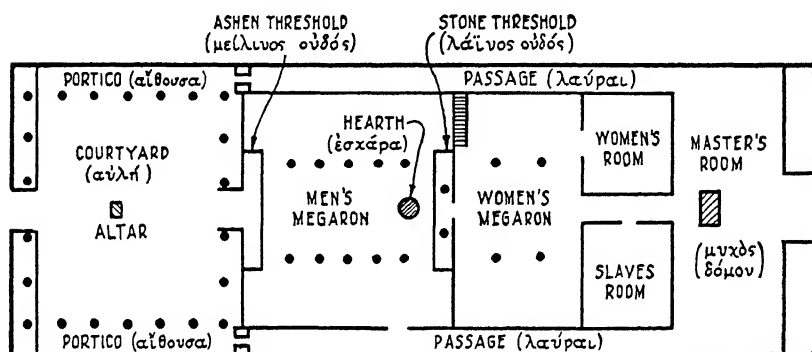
PLAN, CONVENTIONAL HOMERIC HOUSE
